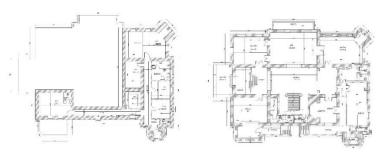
Basement Floor Plan. Fig. 5. Ground Floor Plan. F
